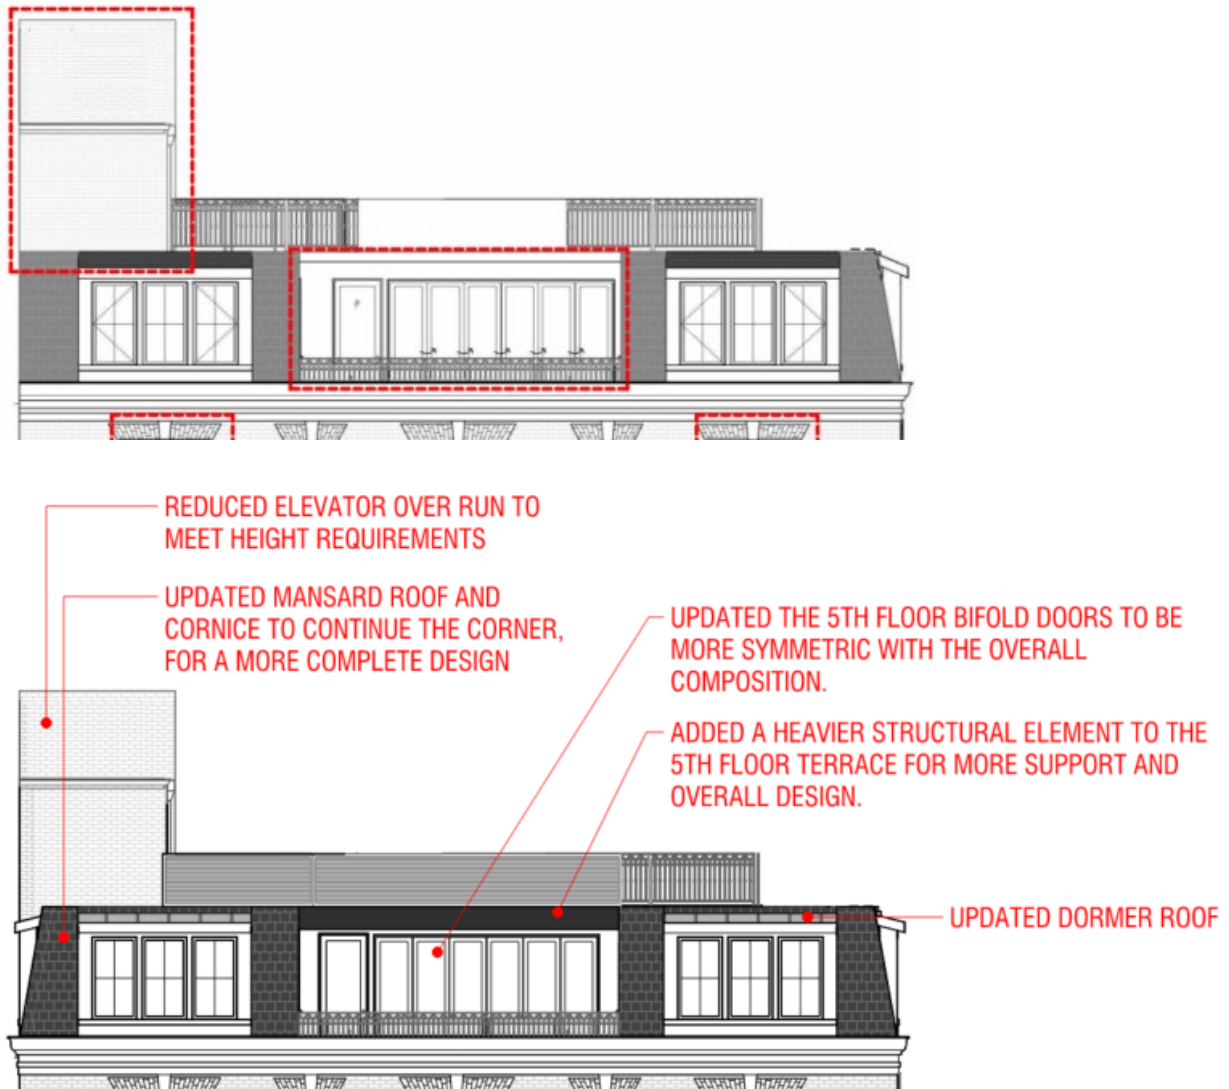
Previous (top) and revised (bottom) east elevation of the fifth floor
